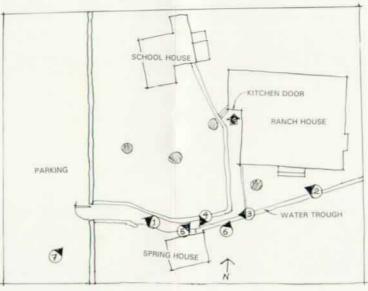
PHOTO KEY PLAN FOR EXISTING CONDITIONS
